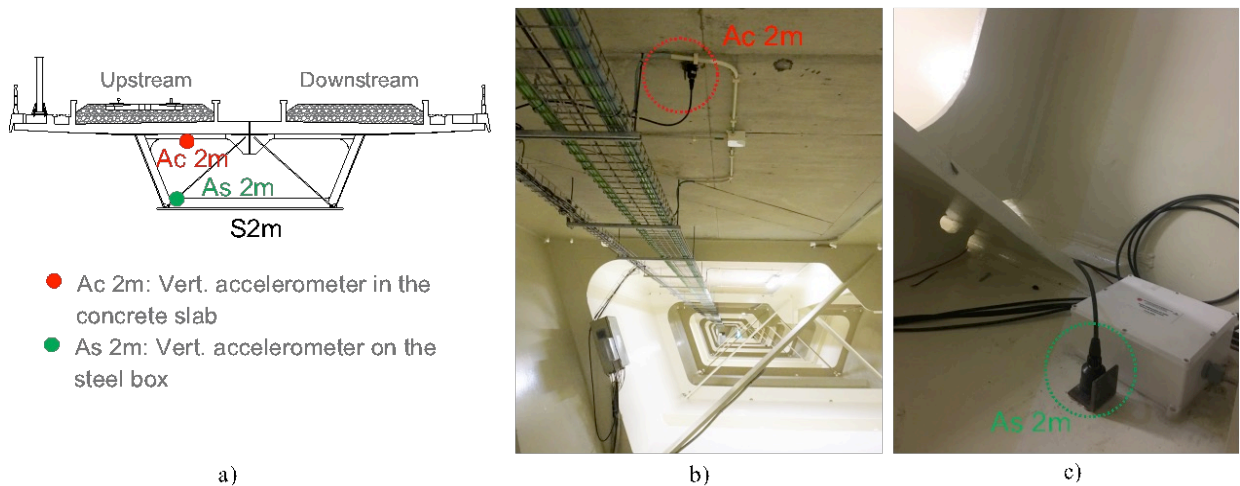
Accelerometers installed at the second mid-span: a) cross section of the bridge, b) vertical accelerometer fixed to the concrete slab (Ac 2m), c) vertical accelerometer fixed to the steel box (As 2m).
